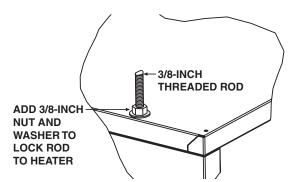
Heater Suspension Using Field-Supplied Threaded Rods
